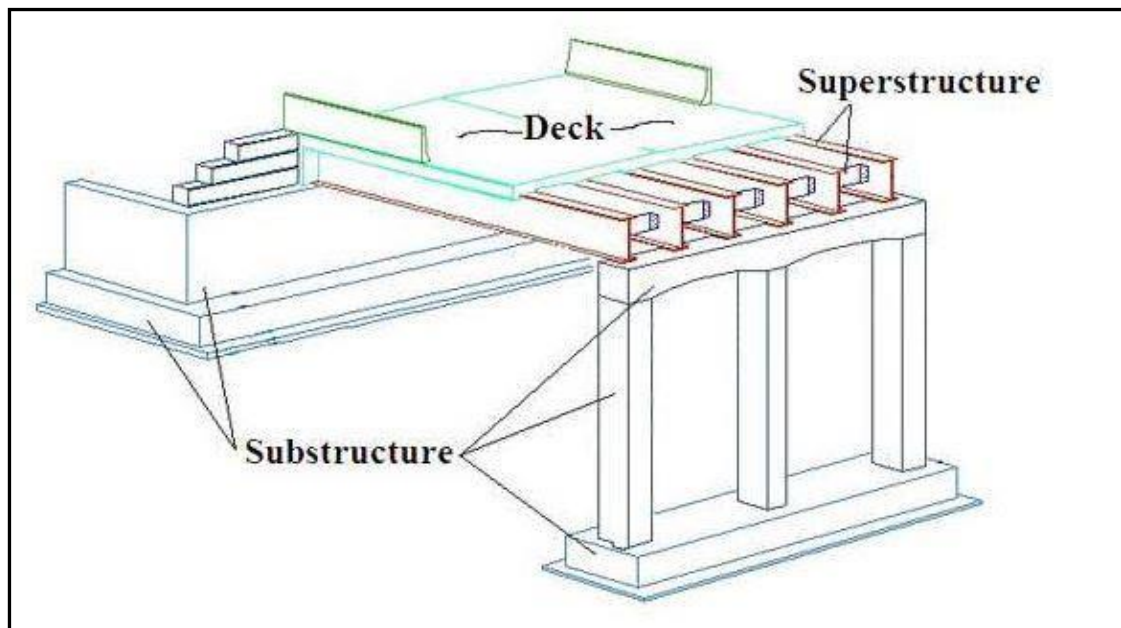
Structural Elements of a Typical Highway Bridge (MDOT, 2017)
